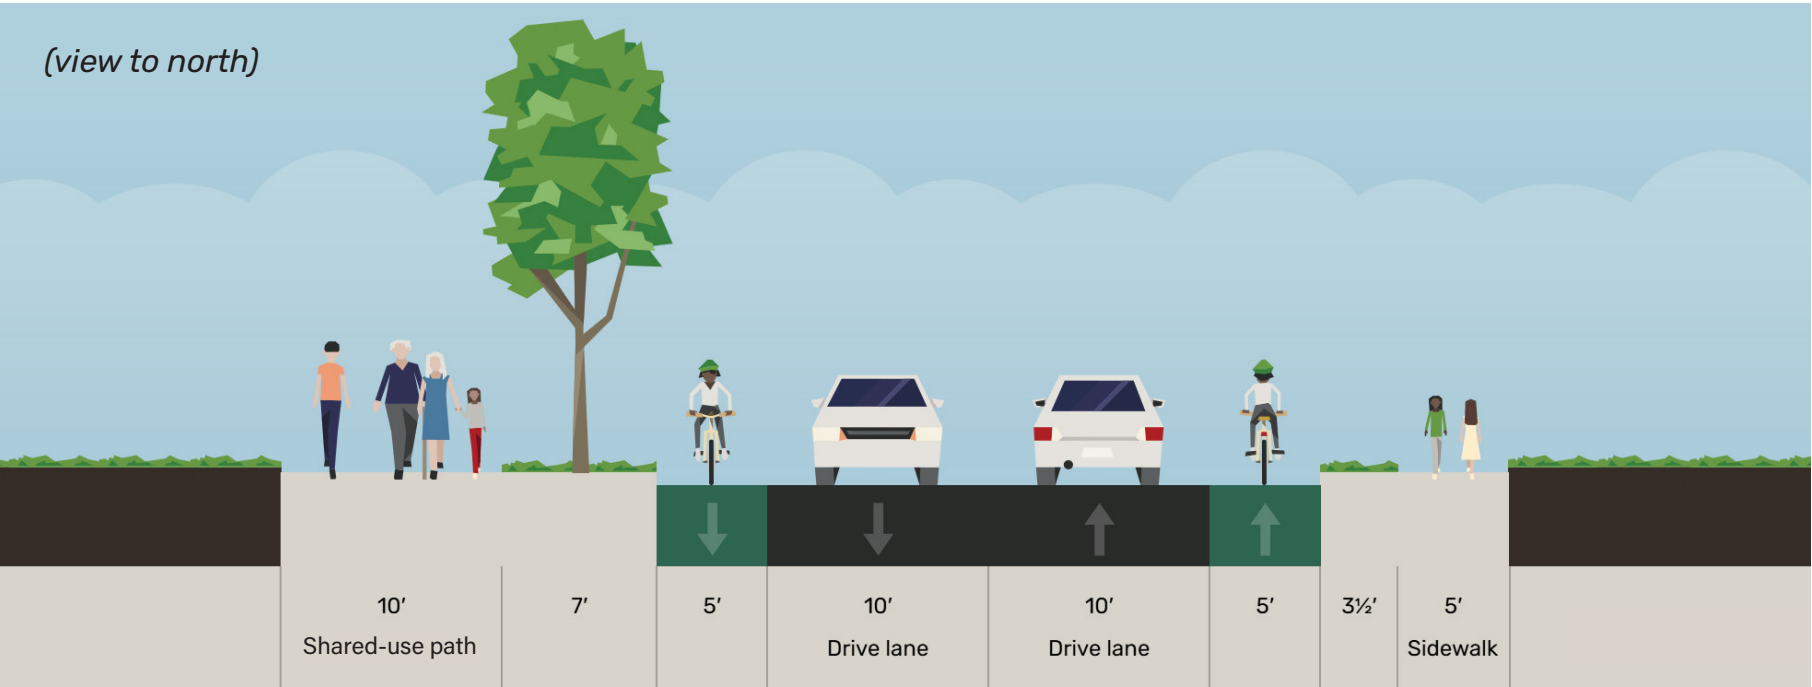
Proposed Typical Cross-Section on Shady Rest Lane (Corinth Parkway to Fritz Lane) (55' ROW)
